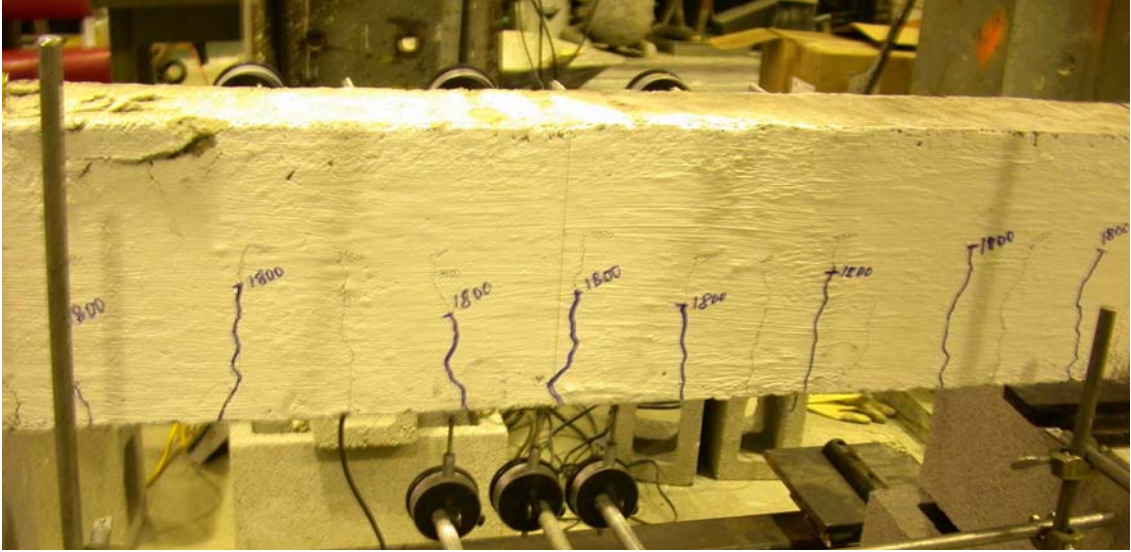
Crushing of Compression Side of Beam and Cracking at Failure, Beam P-1.
